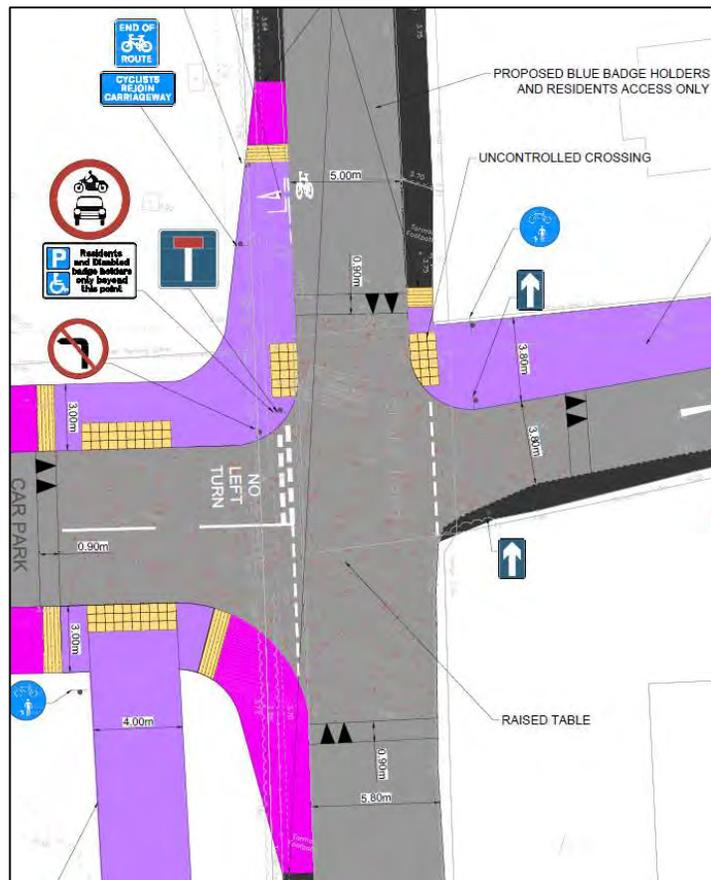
Shore Road Access North of Proposed Car Park Junction
